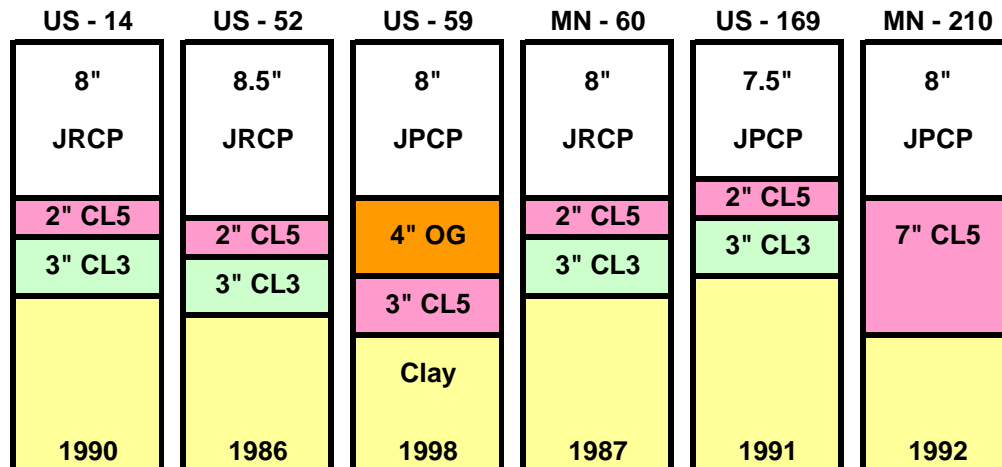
Minnesota concrete pavement sections chosen for comparison to MnROAD test sections.
